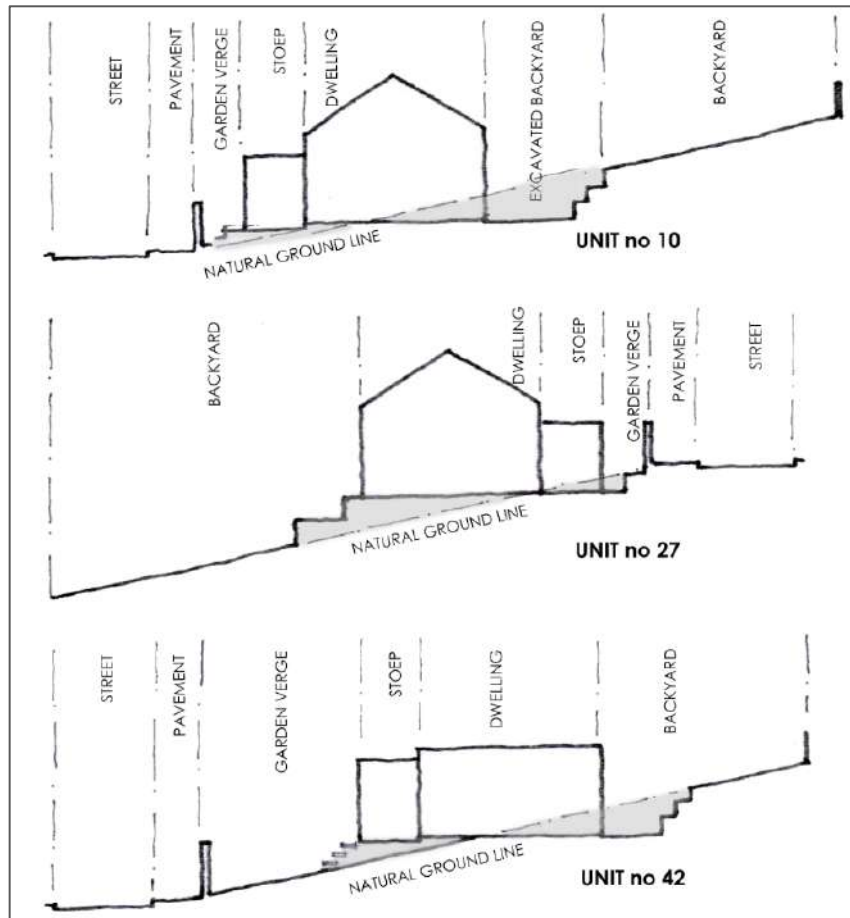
Example of the guidelines on cut and fill on sloped topography, Architectural guidelines Rev 14 2026
